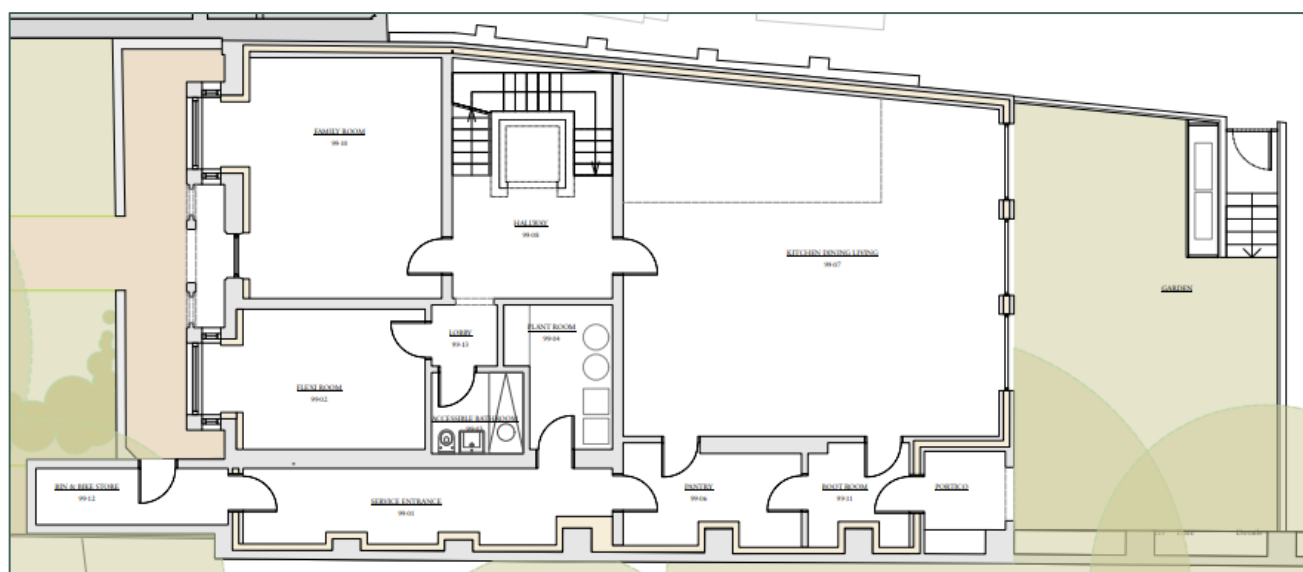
Lower-Ground Floor Plan of the Proposed Scenario (Charlton Brown Architecture & Interiors)
